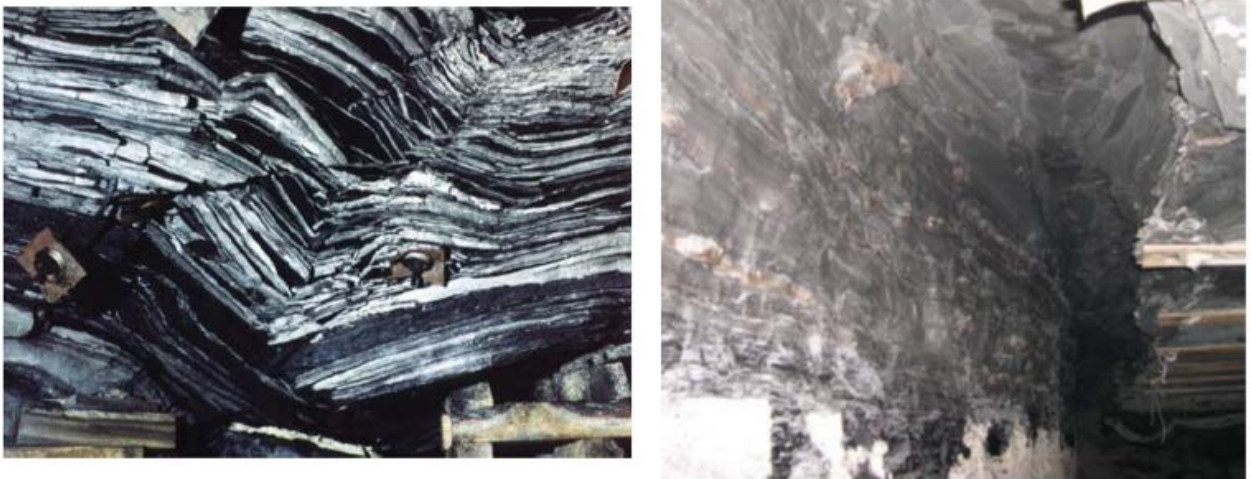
(a) Failure of bedding laminations in the roof (Esterhuizen and Bajpayee, 2012);
